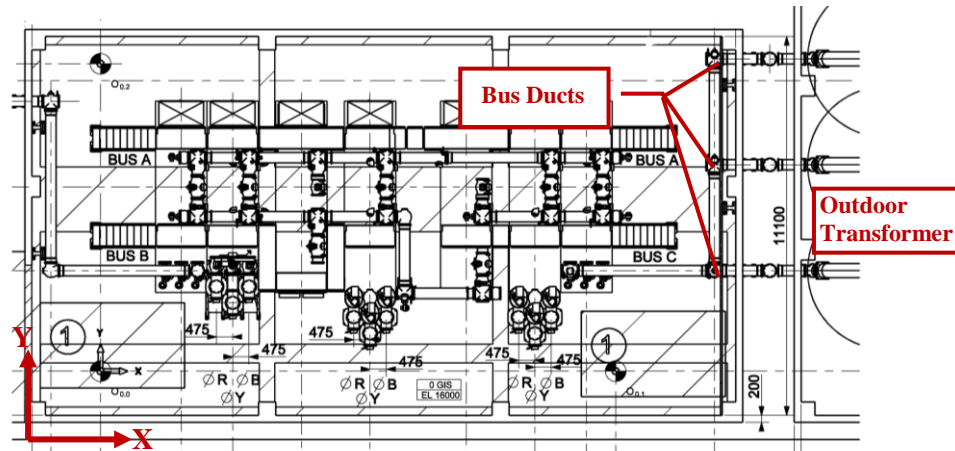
GIS Building floor plan with three bus ducts entering the building on the right. Note the X-Y directions.
